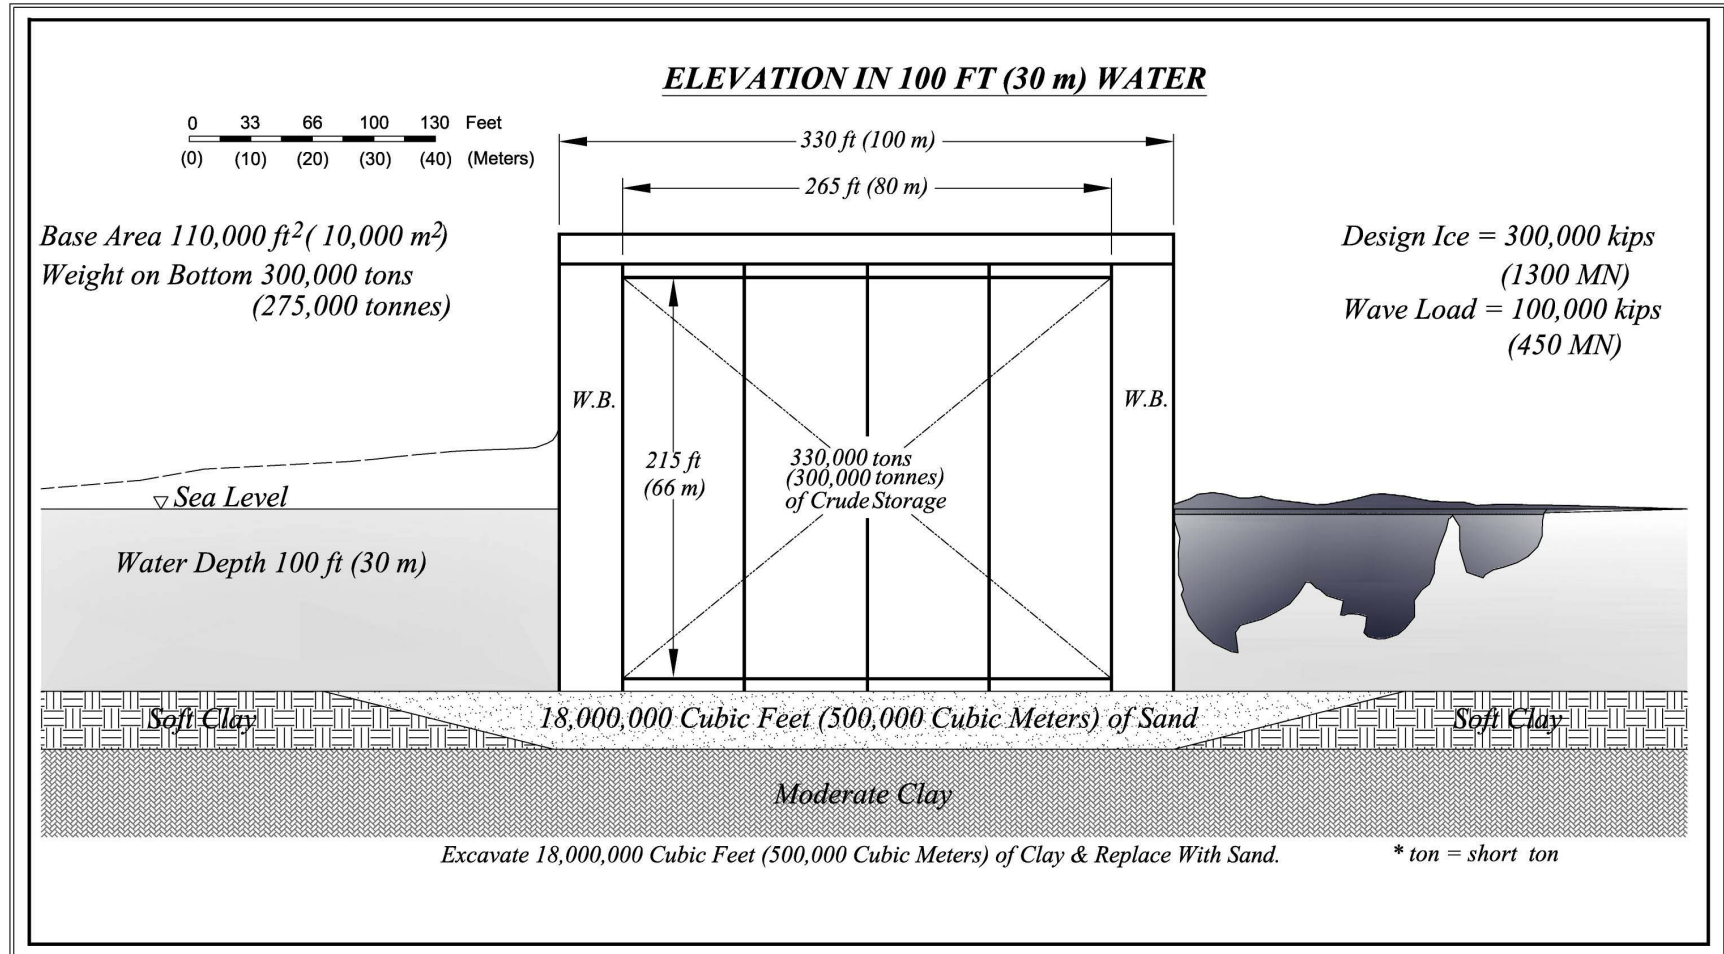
Drawing No.6, Option No.11 – 100 ft (30 m) Storage Hull Transverse Section and Design Particulars
